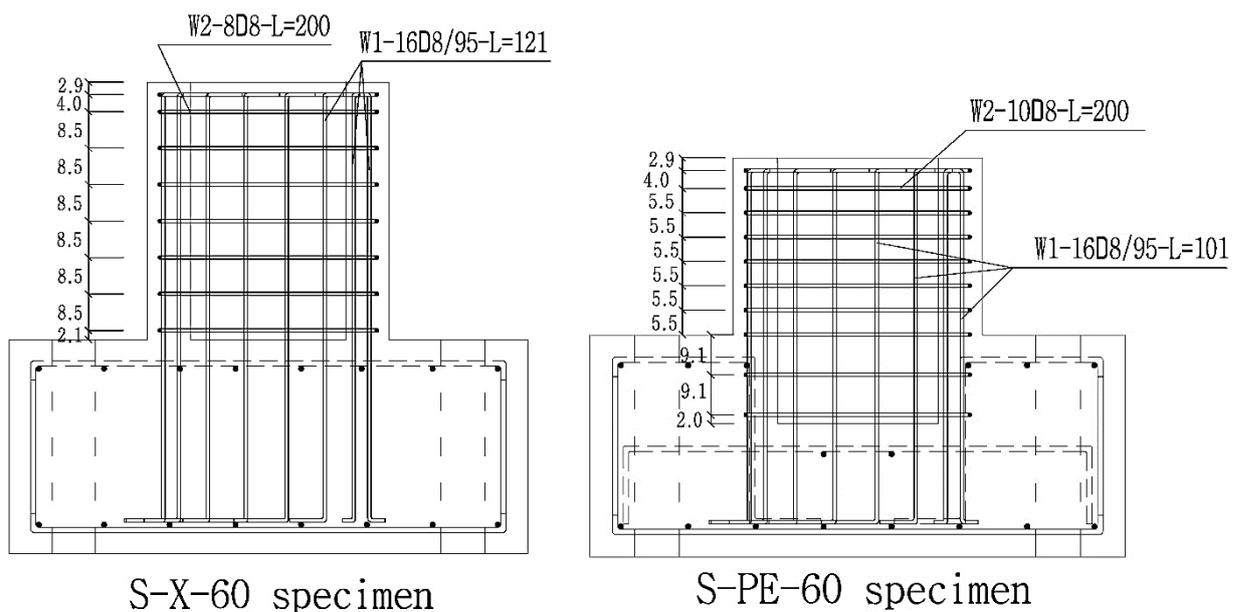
Reinforcement details of pocket of specimens (S-X-60 , S-PE-60) at elevation
